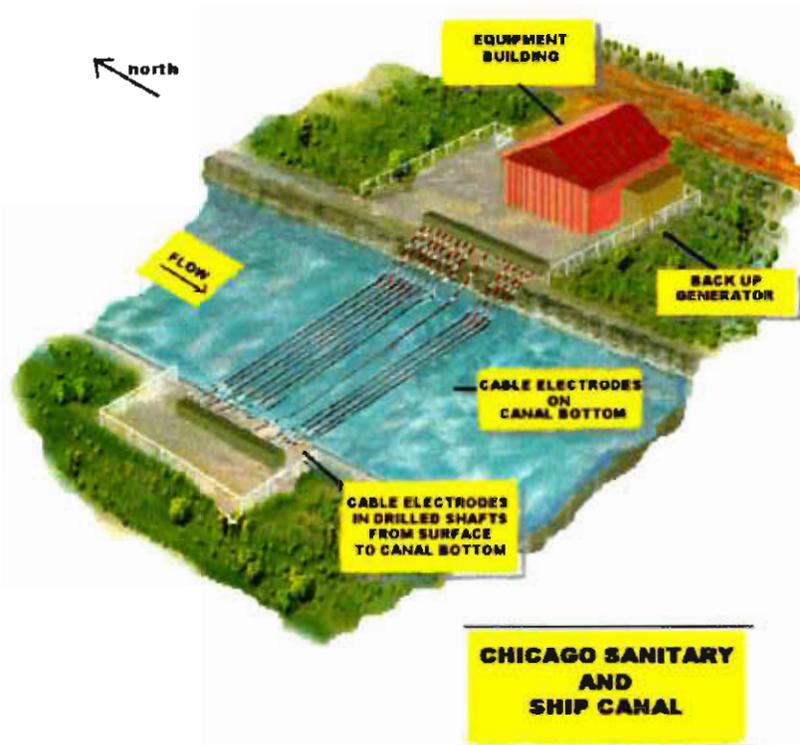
Plan view of how barrier electrodes are placed in canal bottom.
